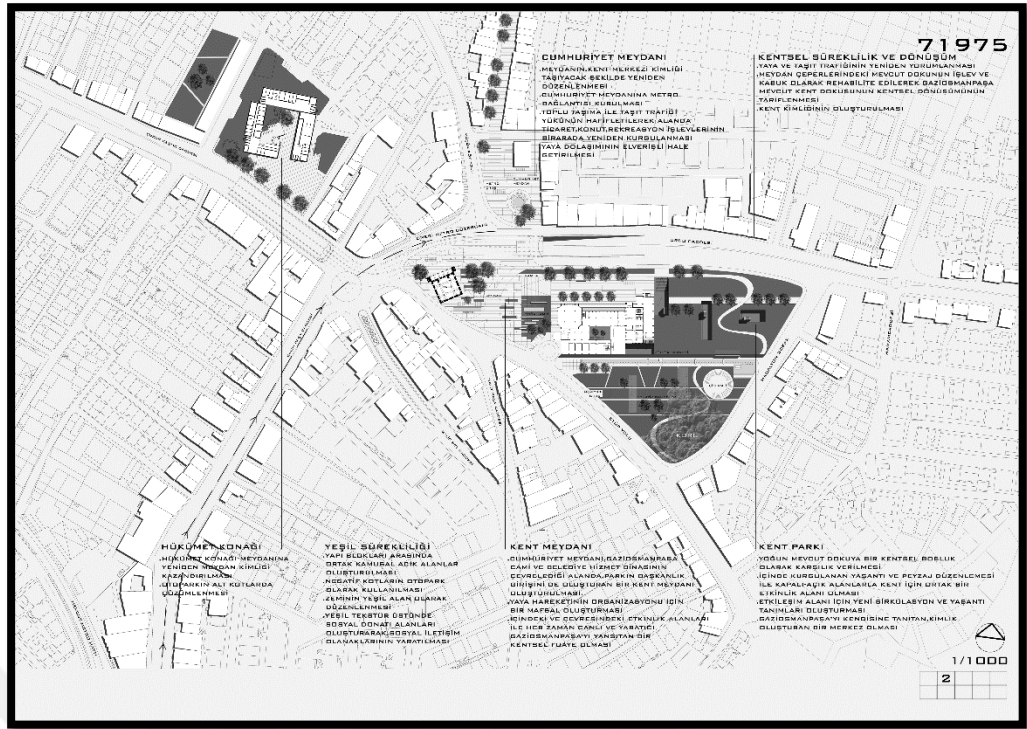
Gaziosmanpaşa Municipality Service Building Competition, First Prize, Site plan (DB Architects,2014)
